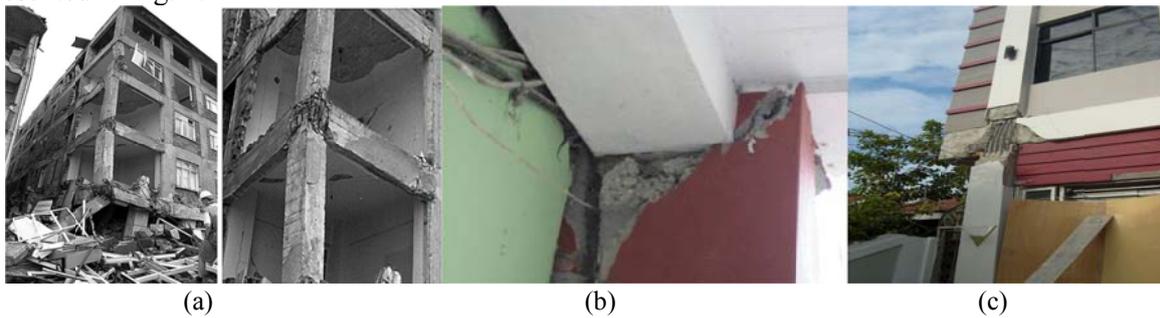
Failure of beam-column joints: (a) Building collapse due to failure of beam-column joints, Turkey (Sezen et al., 2003); (b) Poor seismic detailing of RC frame members and beam-column joints, India (Murthy, 2001); (c) No stirrups in beam-column joint, Indonesia (Bothara et al., 2010)
